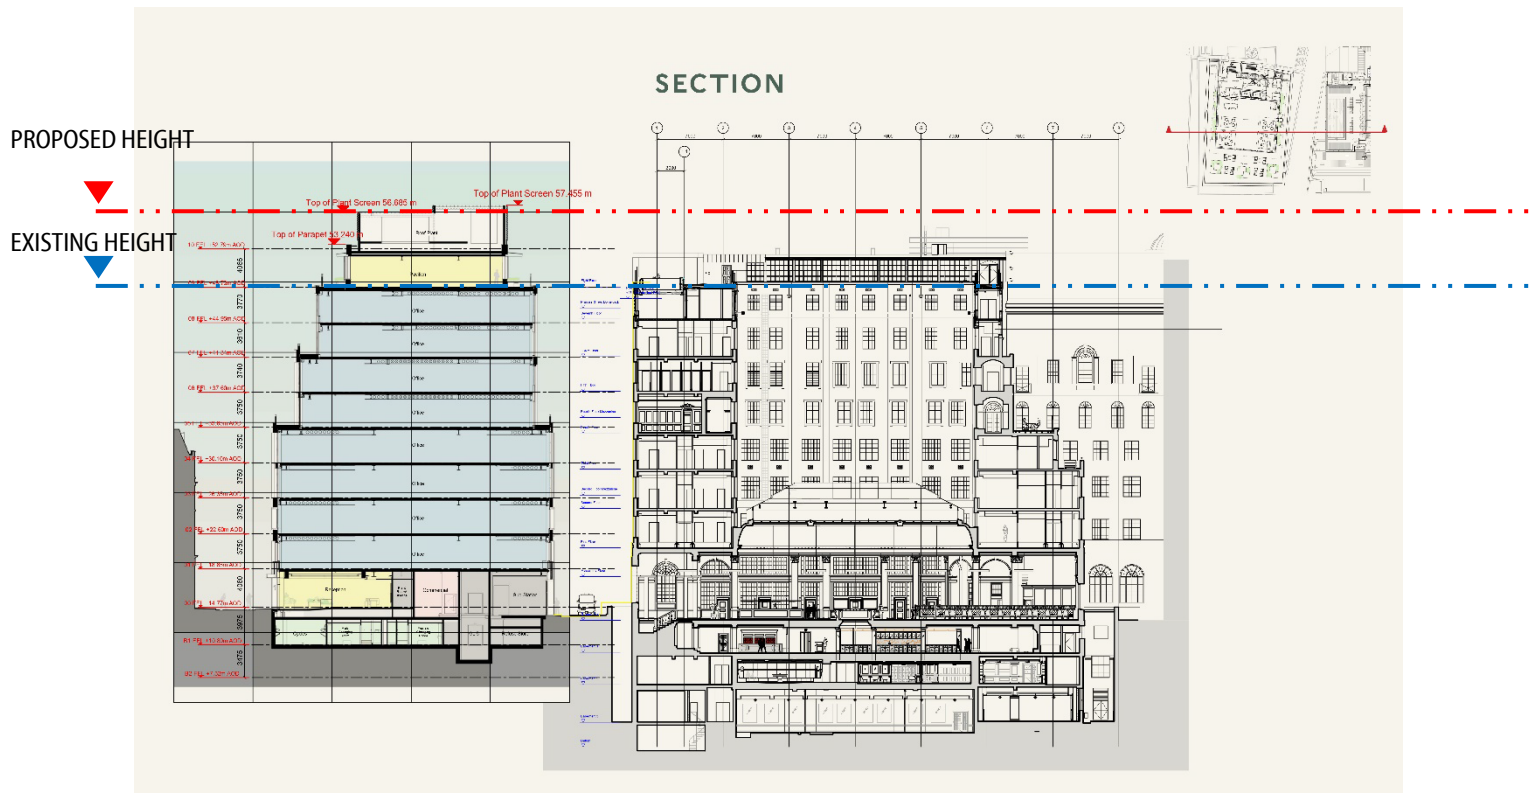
Section showing the height of the new roof additions and the relationship with Ned Building.
